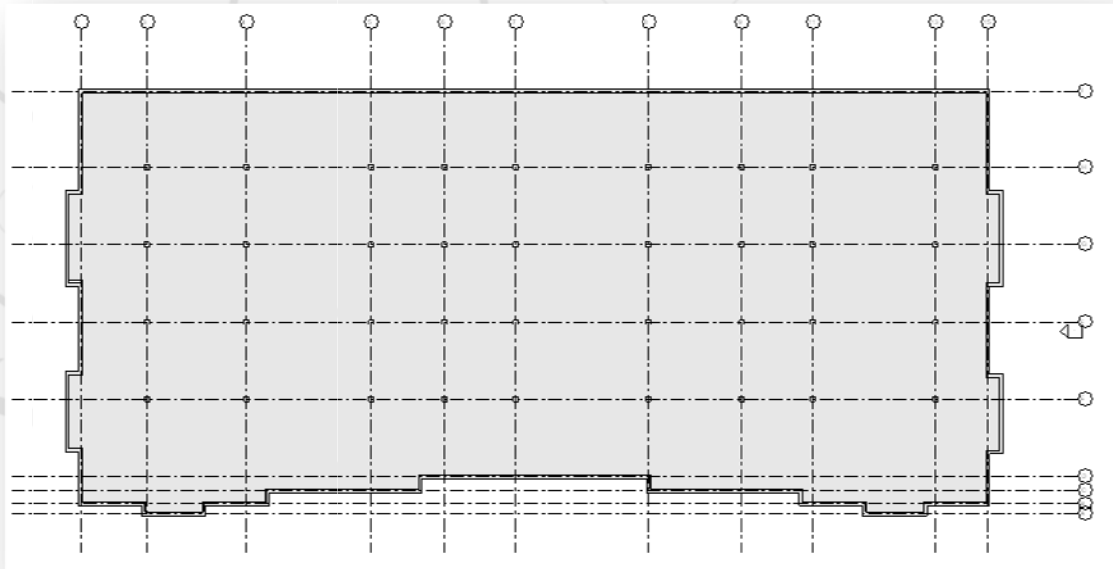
Current Structural System Grid with Structural Steel Column Tubing
